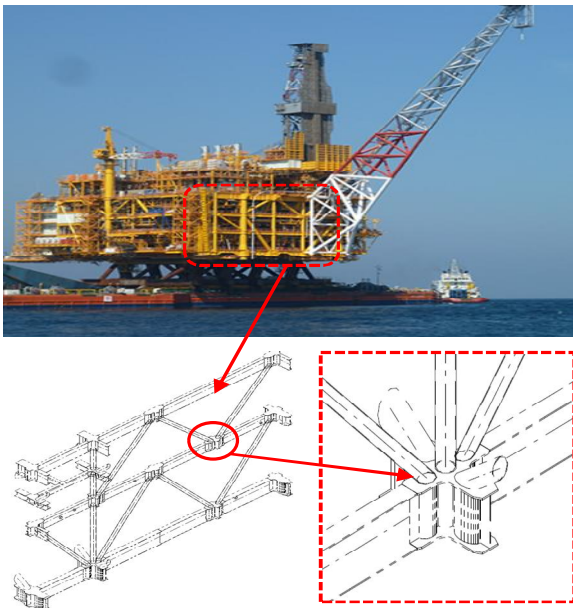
Typical offshore topside structure and detailed pipe joints.
